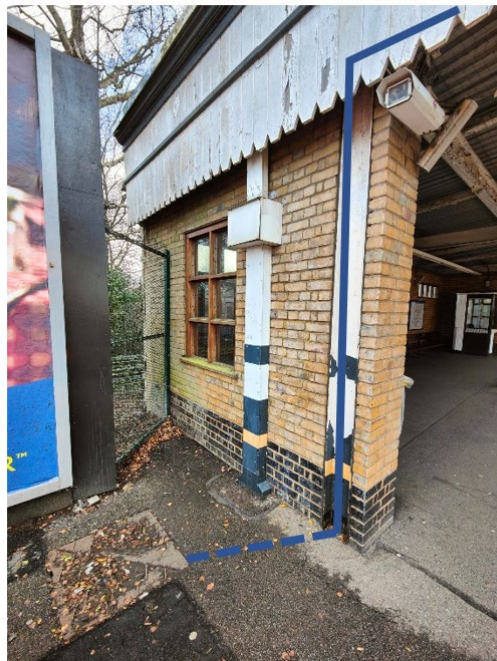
New OPO/OTC CRMS plat 1 towards headwall
